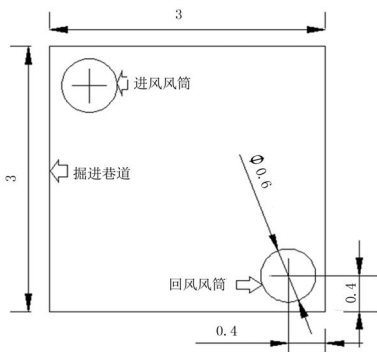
Cross-section of longitudinal section of long duct forced and short duct exhaust three-dimensional model
